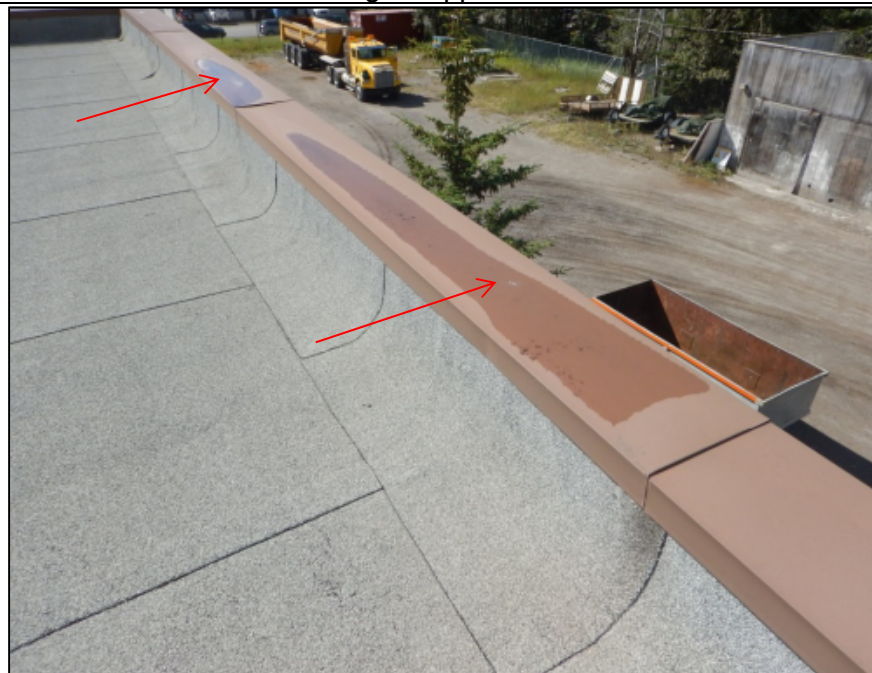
Ponding was observed on the surface of the Garage roof's existing pre-finished metal parapet wall cap flashings. The colour of the metal cap flashings is faded.
